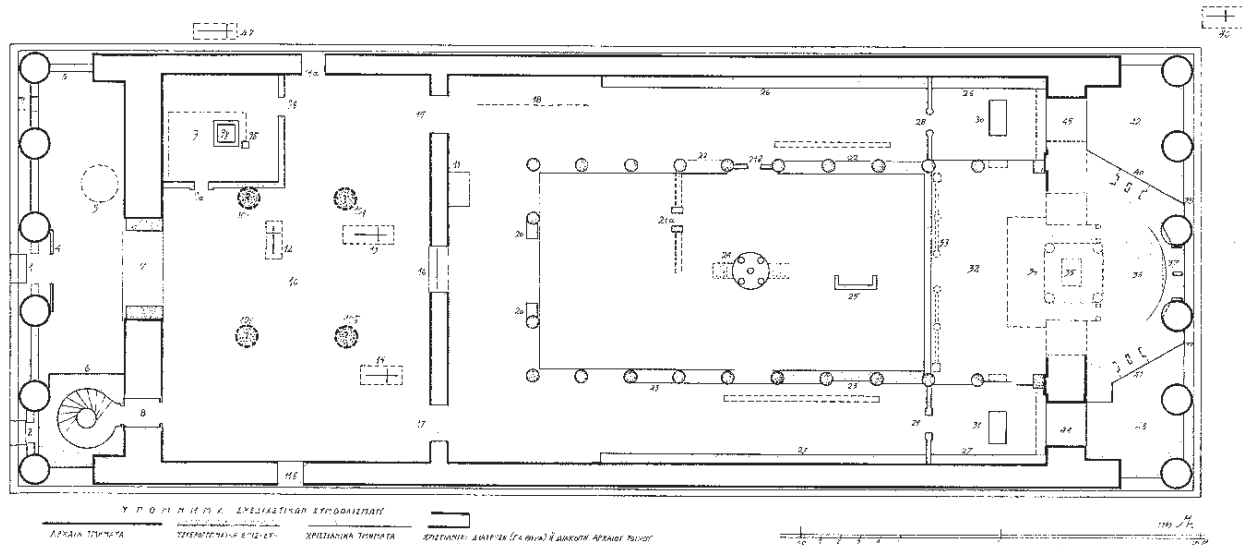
Floorplan of the Parthenon as a church (drawing courtesy Manolis Korres)
